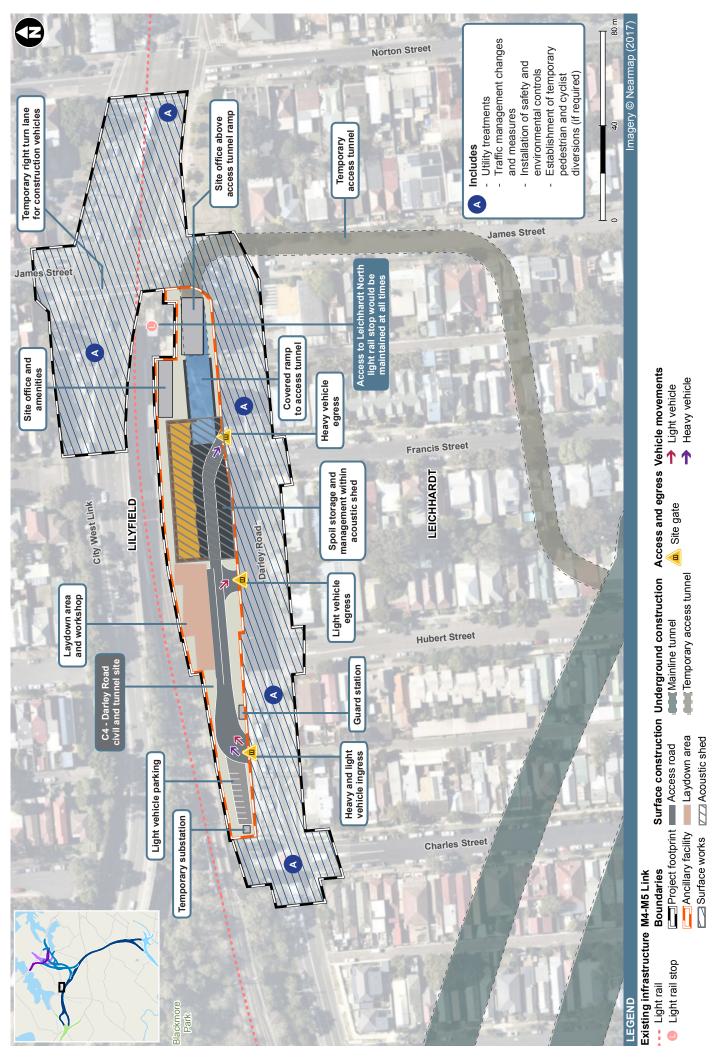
EIS Indicative Darley Road civil and tunnel site (C4) layout
